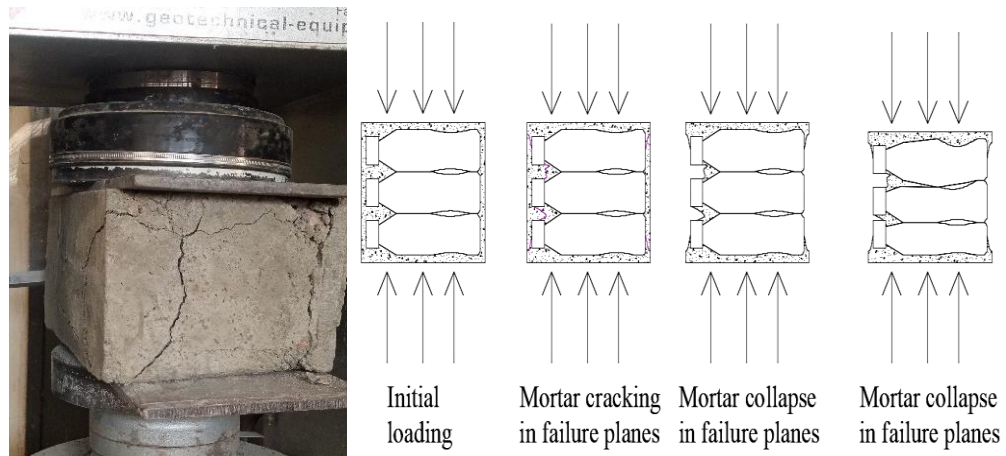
Loading of masonry units in the horizontal orientation till failure/collapse.
